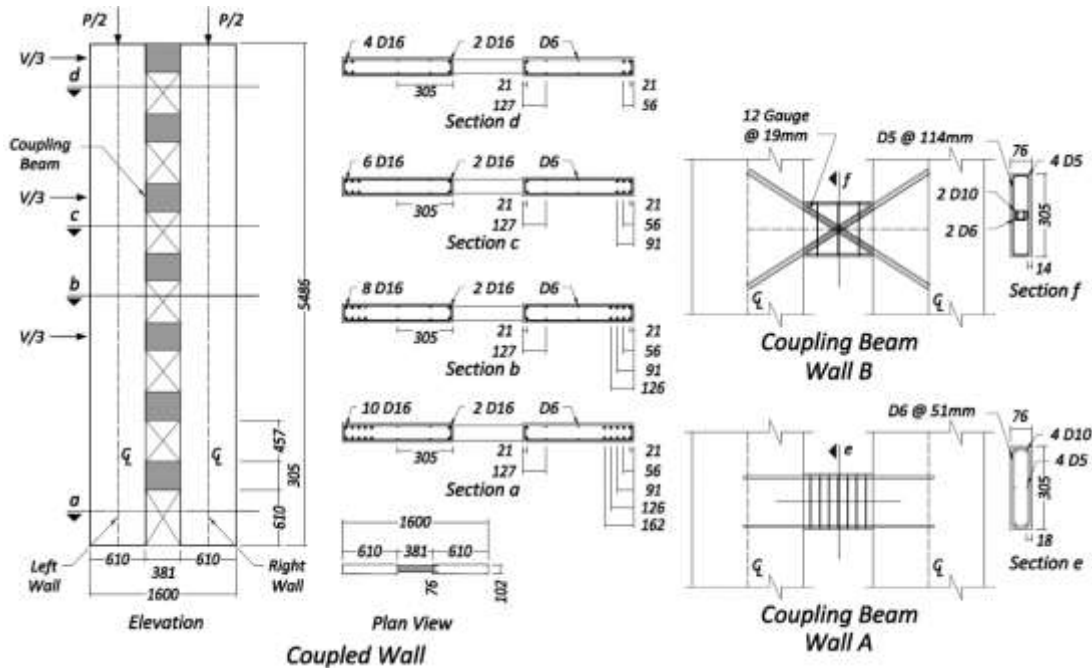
Dimensions and reinforcement details for wall piers and coupling beams of Wall A and Wall B.
